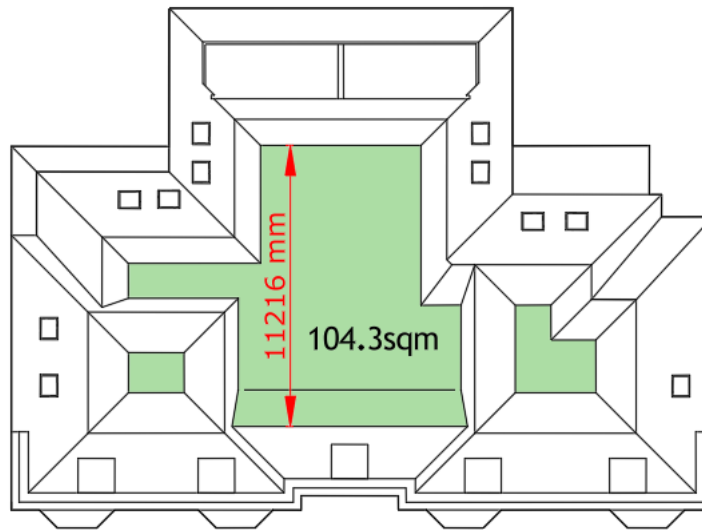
Approved crown roof at no.137 Ducks Hill Road, HA6 2SQ
